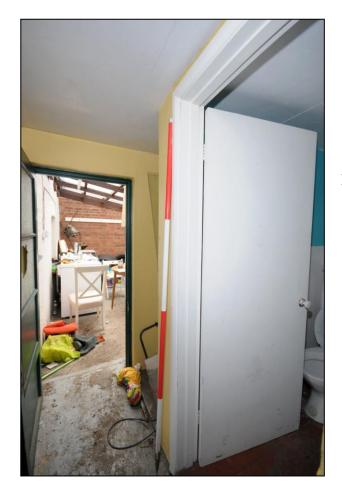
No. 43, rear extension Looking south towards the conservatory (Scale 2m)
